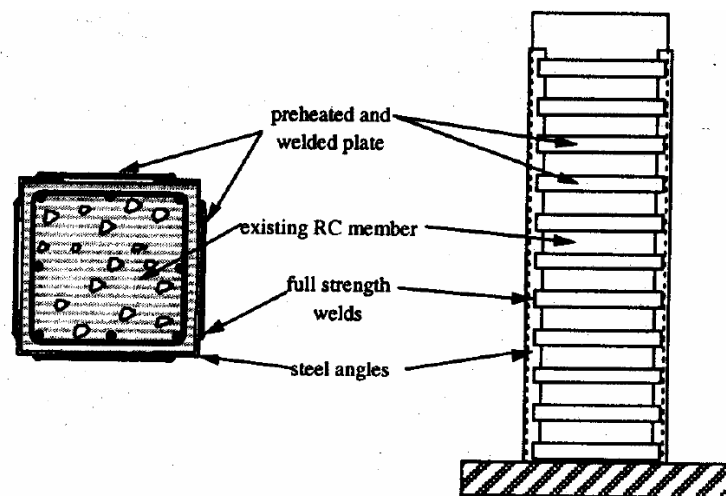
Steel jacketing solution for a reinforced concrete column (fib, 2003a)
